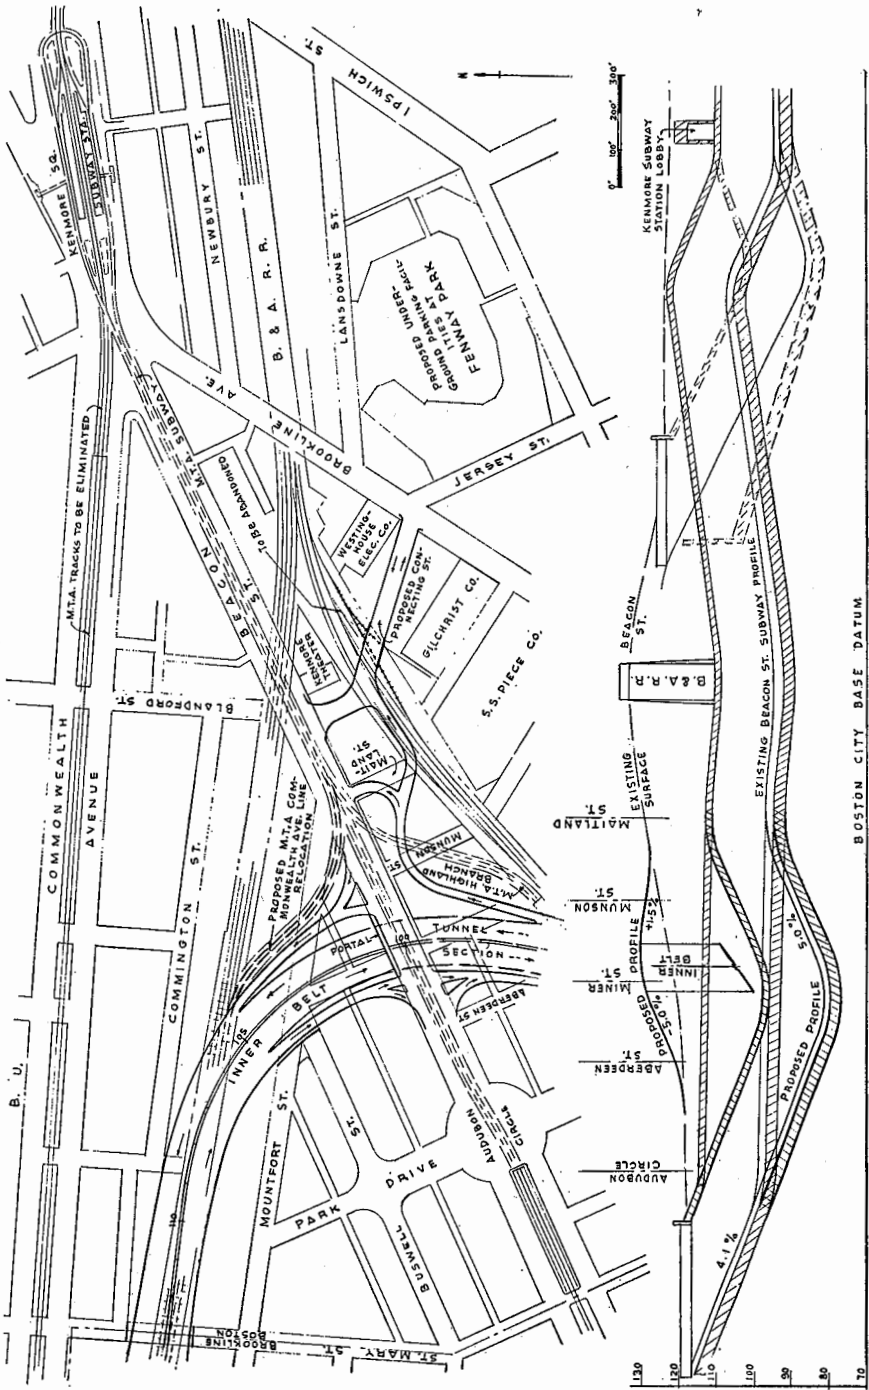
PROPOSED INNER BELT BEACON STREET CROSSING IN RELATION TO PROPOSED UNDERGROUND PARKING FACILITIES AT FENWAY PARK.
